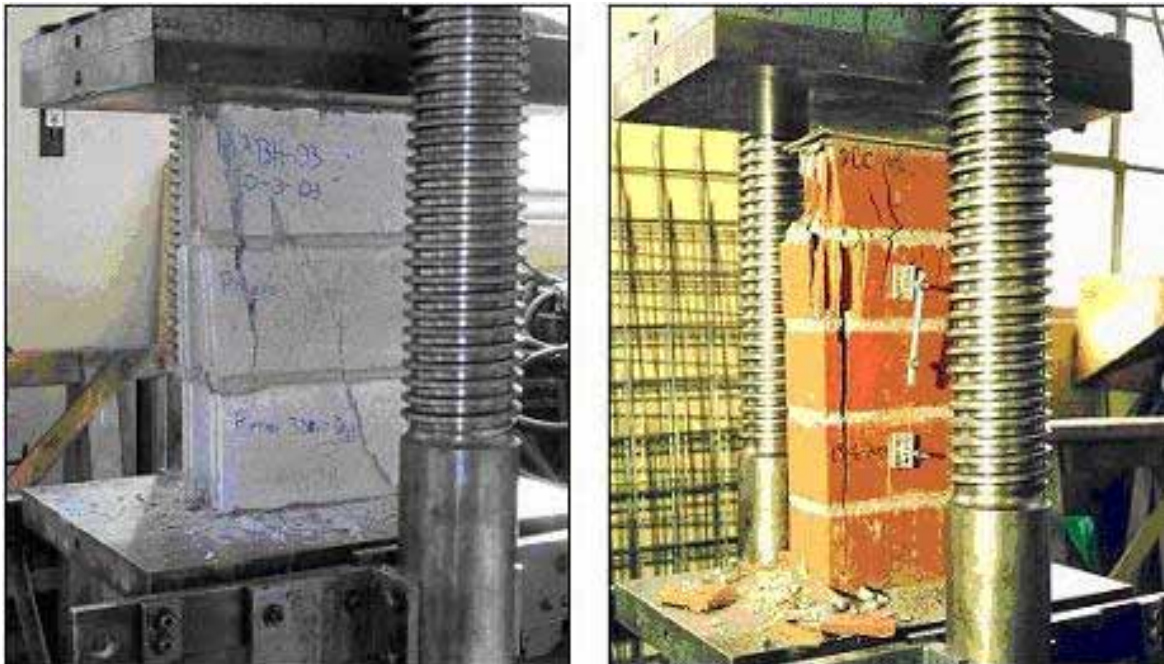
Axial compression test of masonry prism of concrete masonry units (left) and hollow clay brick masonry units (right)
